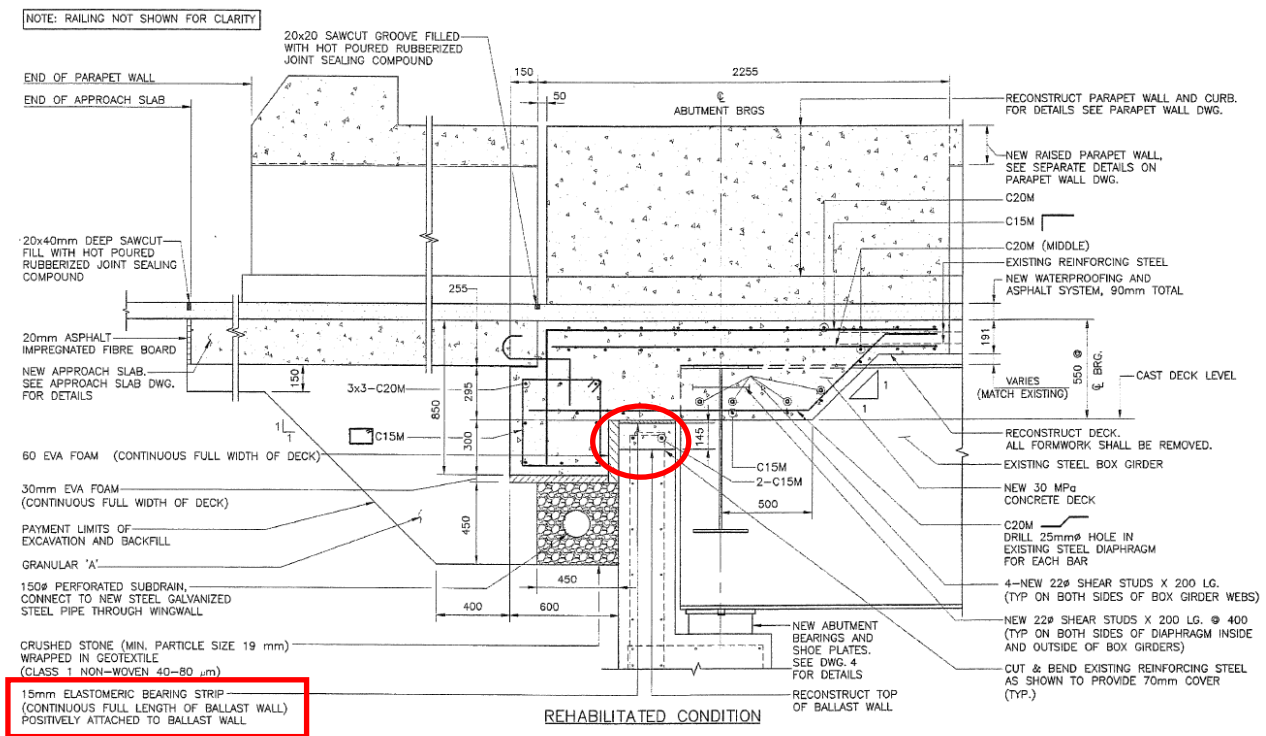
Semi-integral abutment detail for Camlachie Road Underpass [8]
